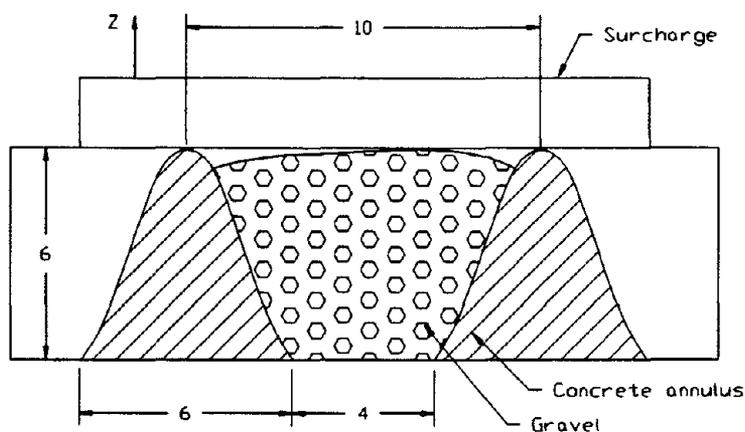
Cross-section of the conical concrete support in the entry showing gravel backfill and overburden surcharge.
